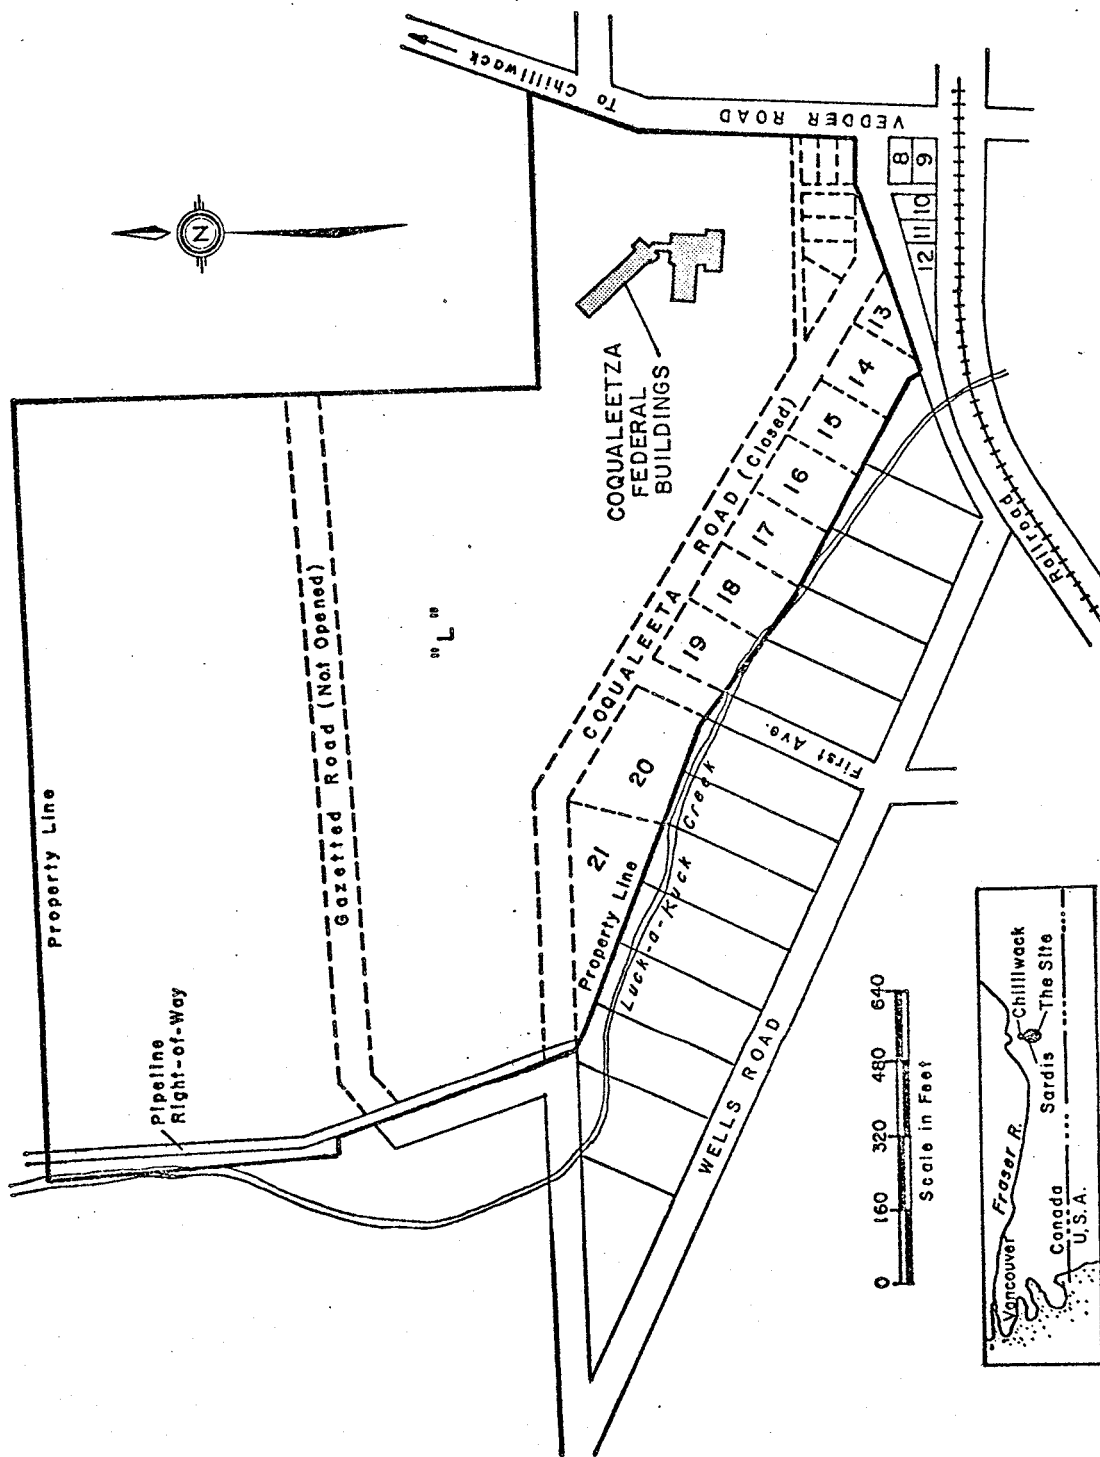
FIGURE I LOCATION PLAN - COQUALEETZA FEDERAL BUILDINGS AT SARDIS, B.C.
